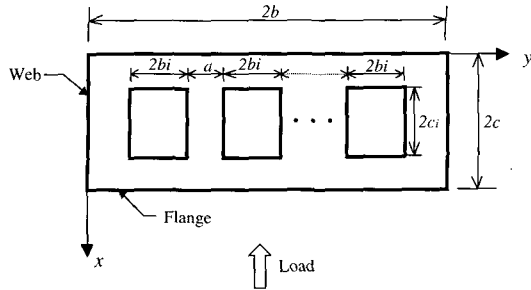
Typical cross section of equivalent tubes-in-tube structure
